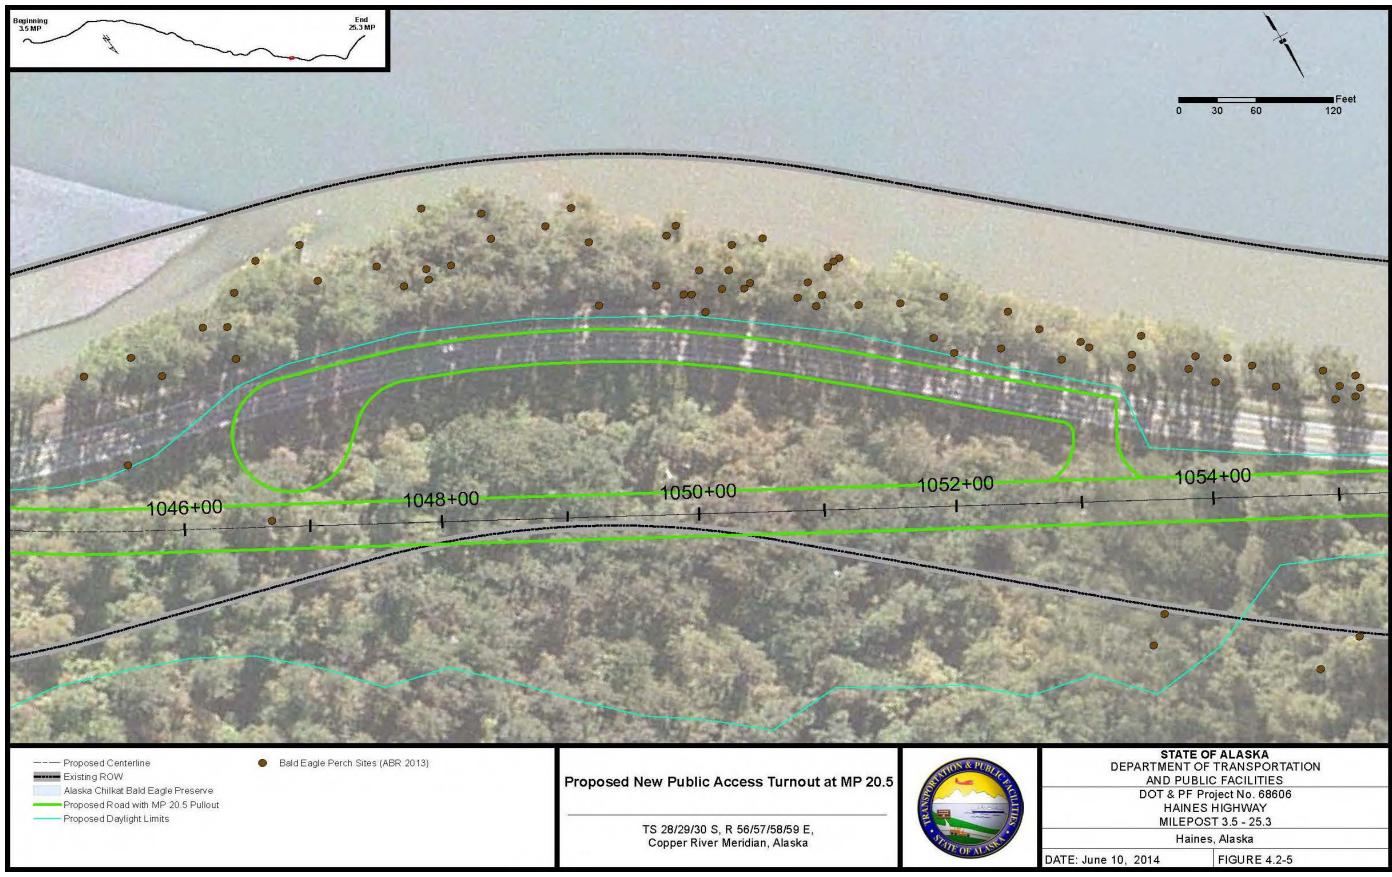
Proposed New Public Access Turnout at MP 20.5
